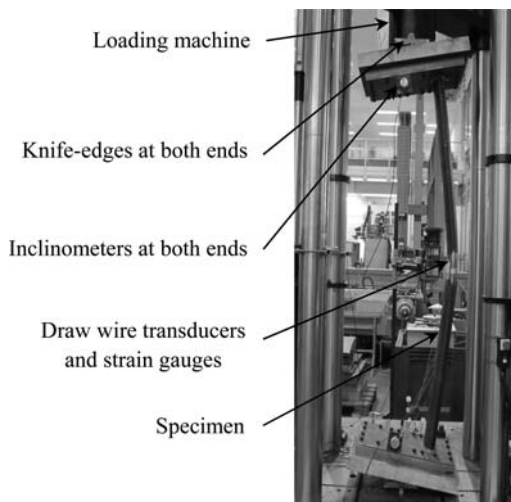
Eccentric compression test configuration – deformed specimen of BC-2- $e_z = 150$ .
